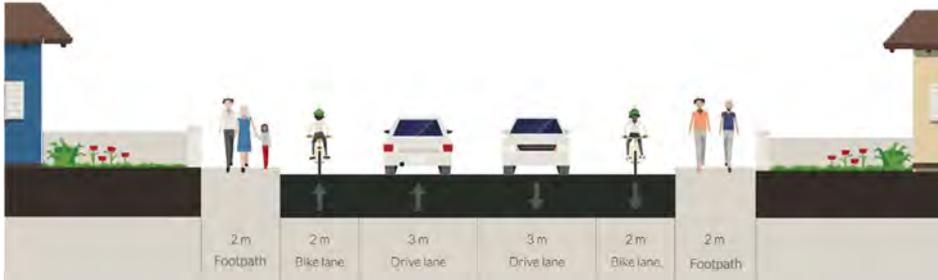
Route 8C, Cross Section A-A Proposed
